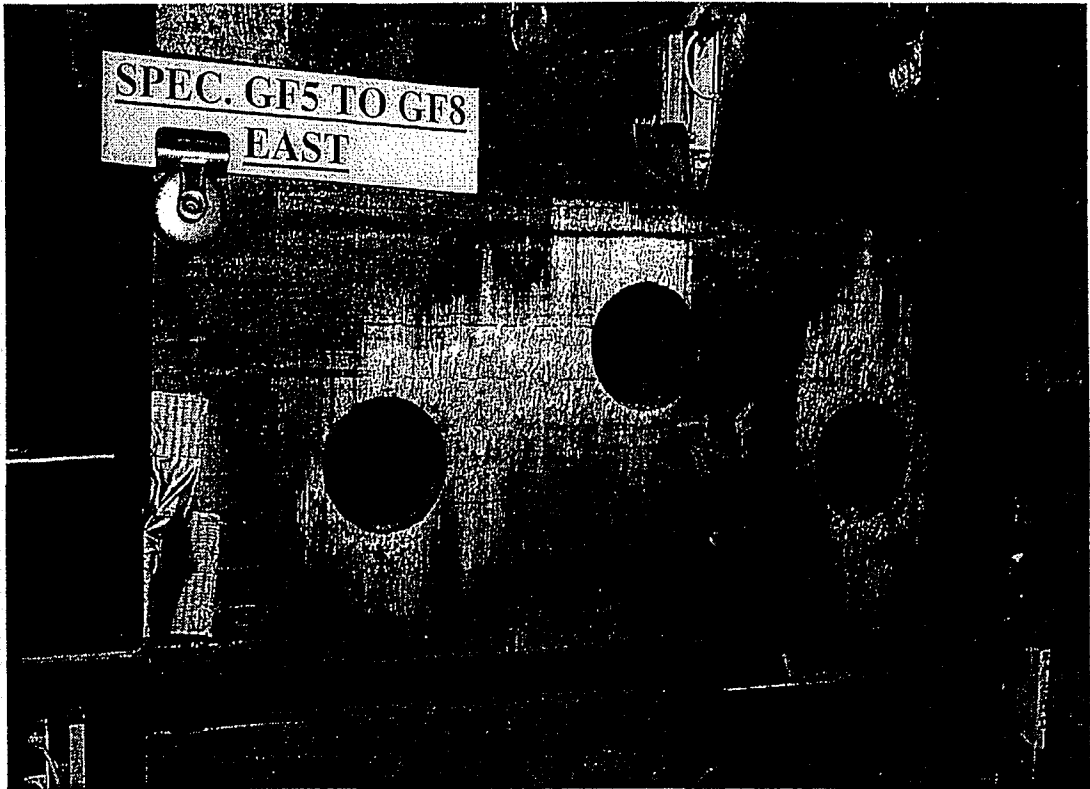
Tests F5 to F8 - East Face of T-stub Web
